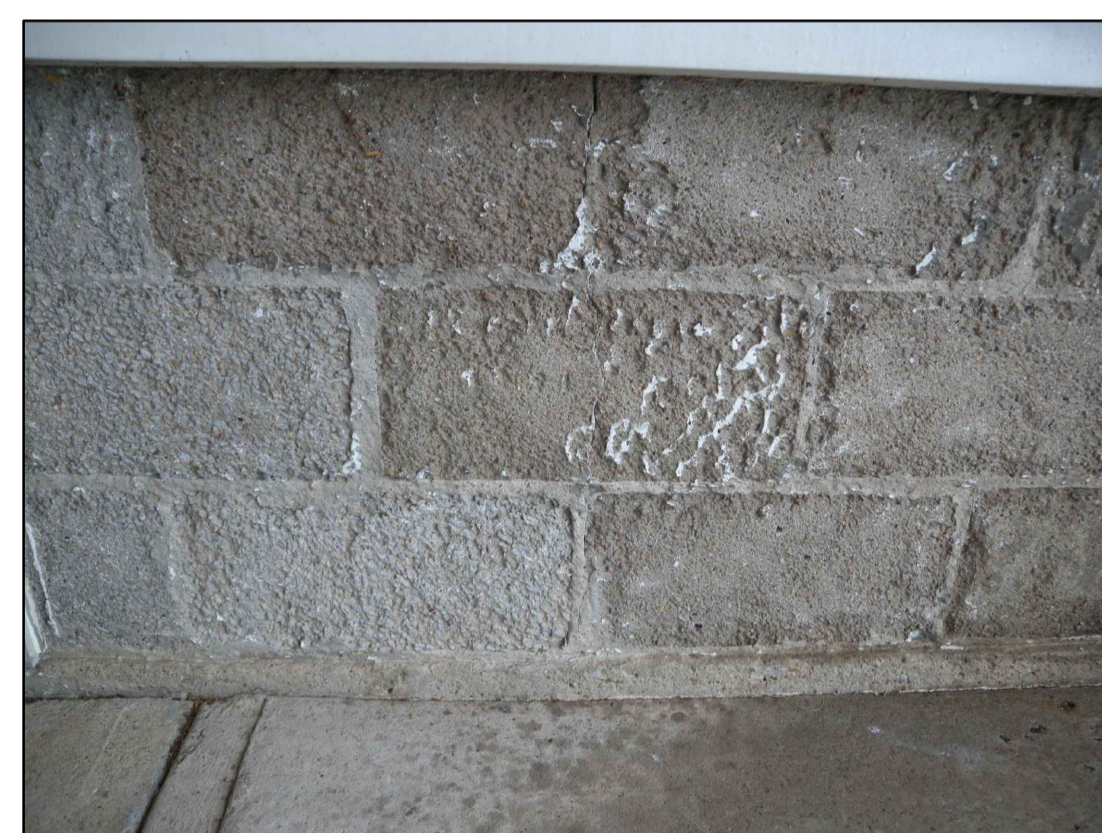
EX. PLINTH. ENTIRE BUILDING TO BE DEMOLISHED.
